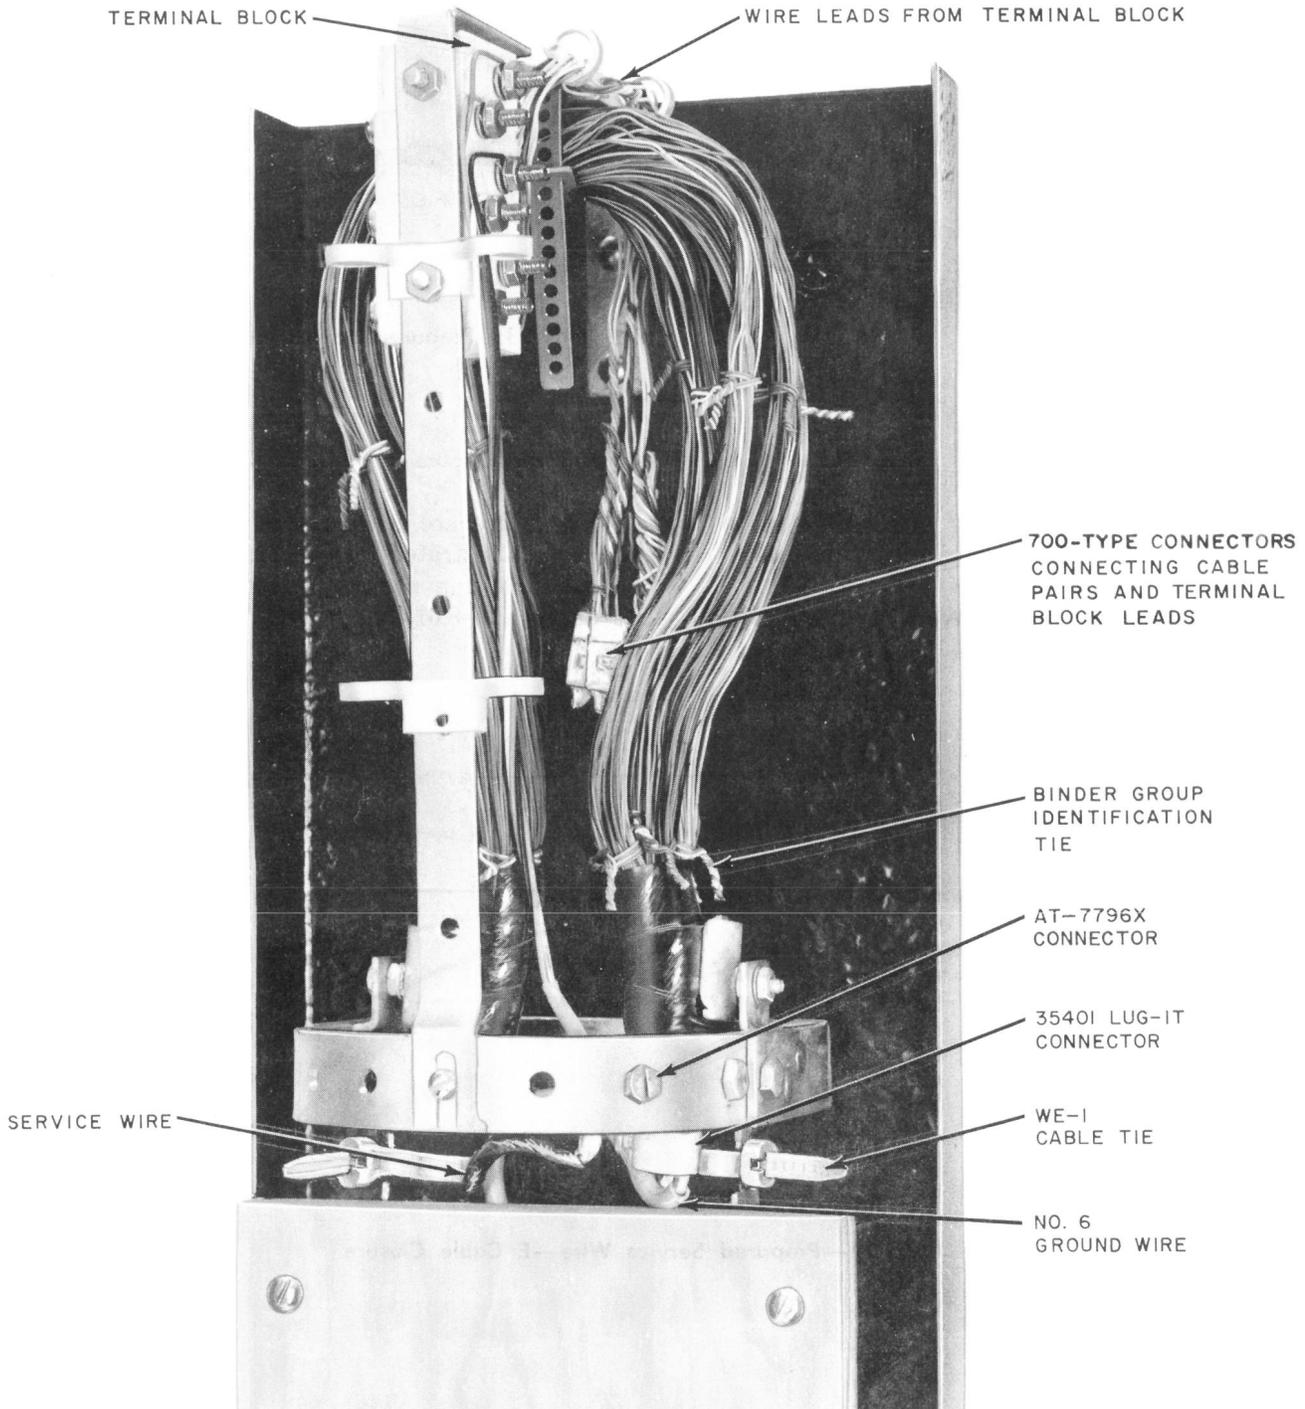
Service Wire Installed—J Cable Closure (Protected)
